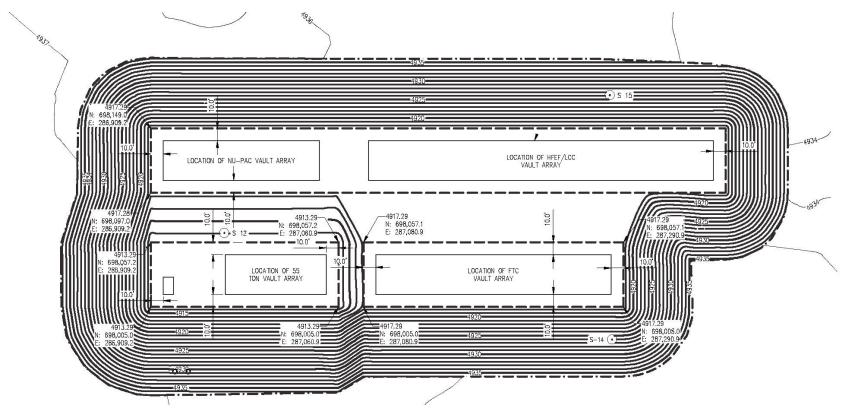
Excavation plan for the vault arrays showing the lateral extent of the excavation area (from Drawing 778766).
